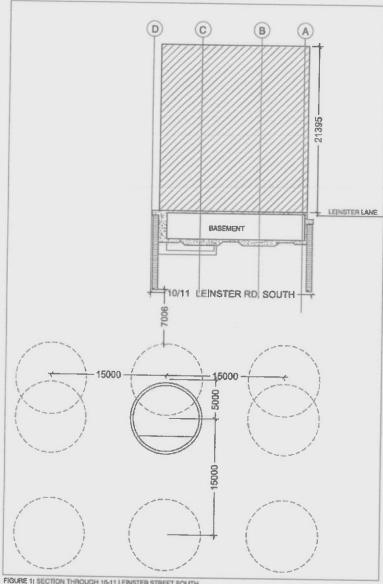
SECTION THROUGH 10-11 LEINSTER STREET SOUTH
